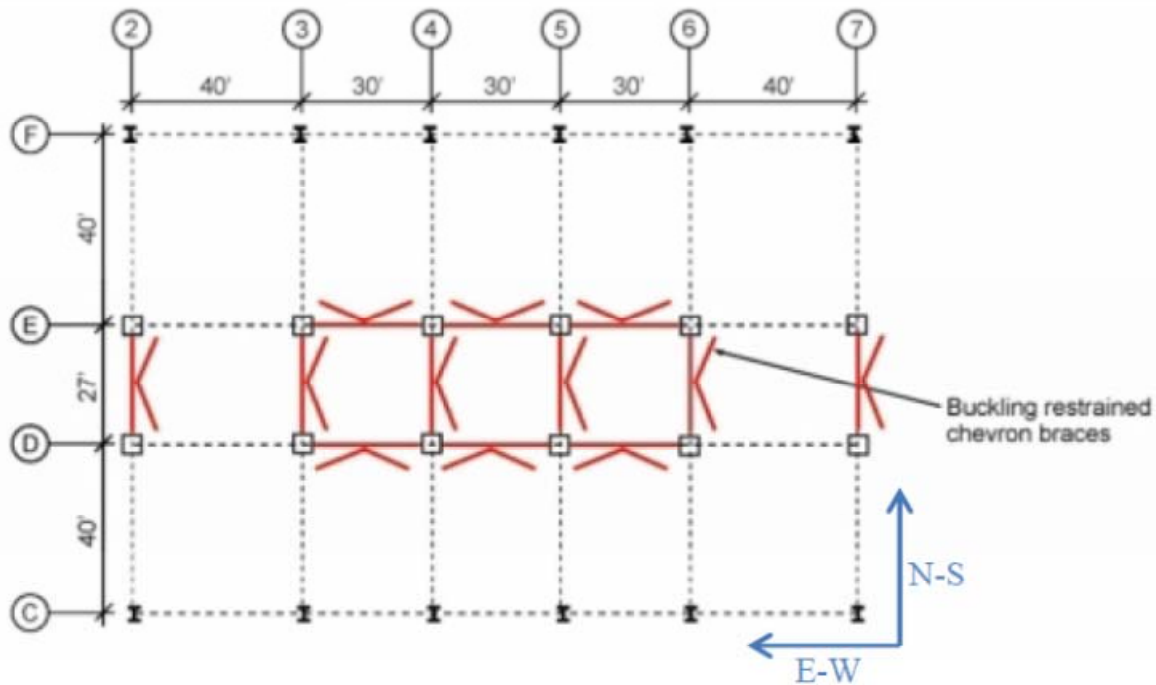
Typical plan view of the BRB building, above ground (Moehle et al., 2011).
